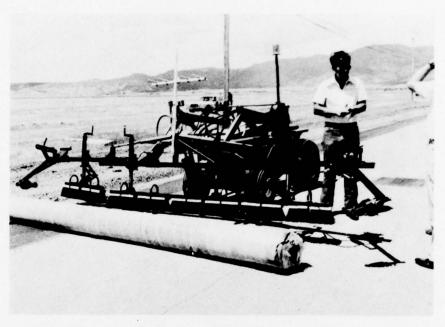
Fort Carson-tractor equipped with special attachments for placement of Petromat fabric
